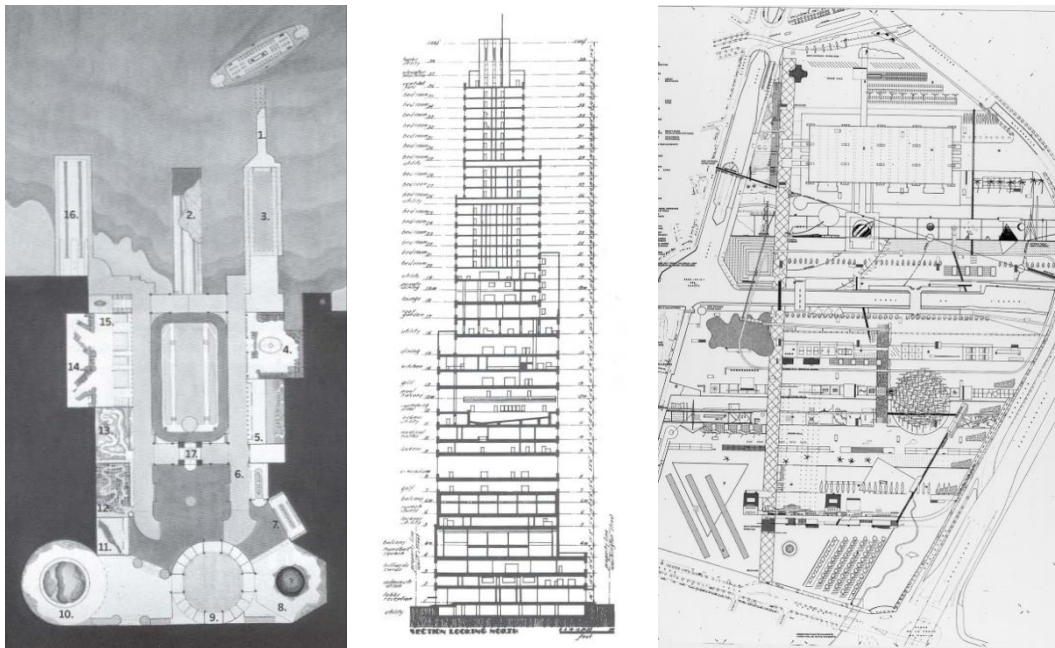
(a) Coney Island Dreamland Plan, (b) Downtown Athletic Club Section, (c) OMA Parc de la Villette Plan
